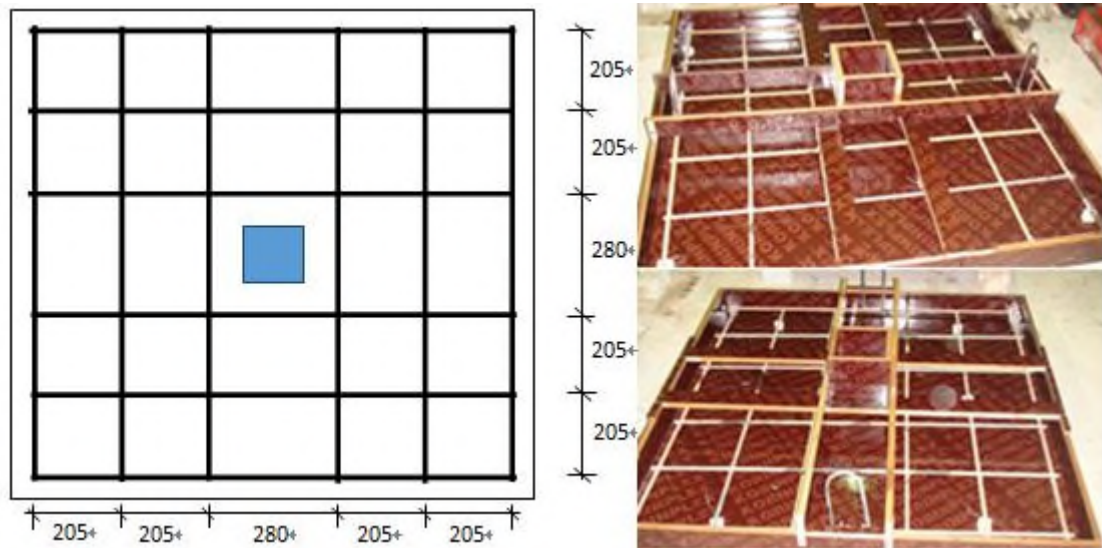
Schematic and actual arrangement of reinforcement in the slab
